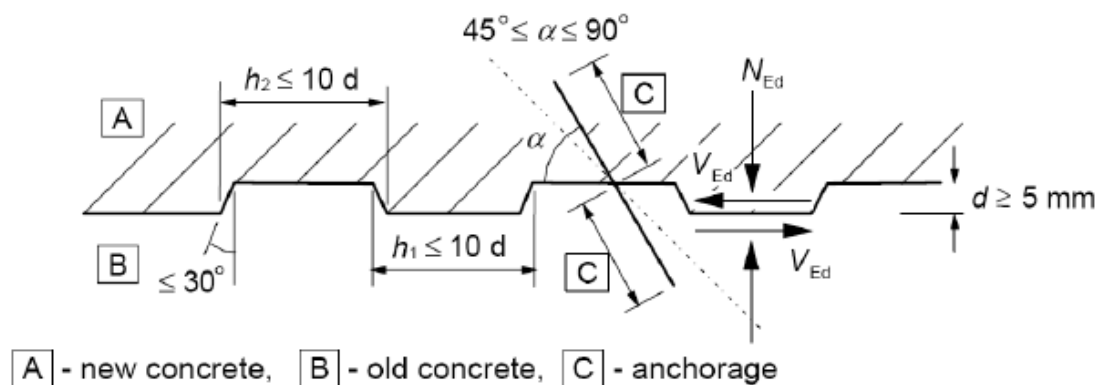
Indented construction joint [European Committee for Standardization, 2004]
